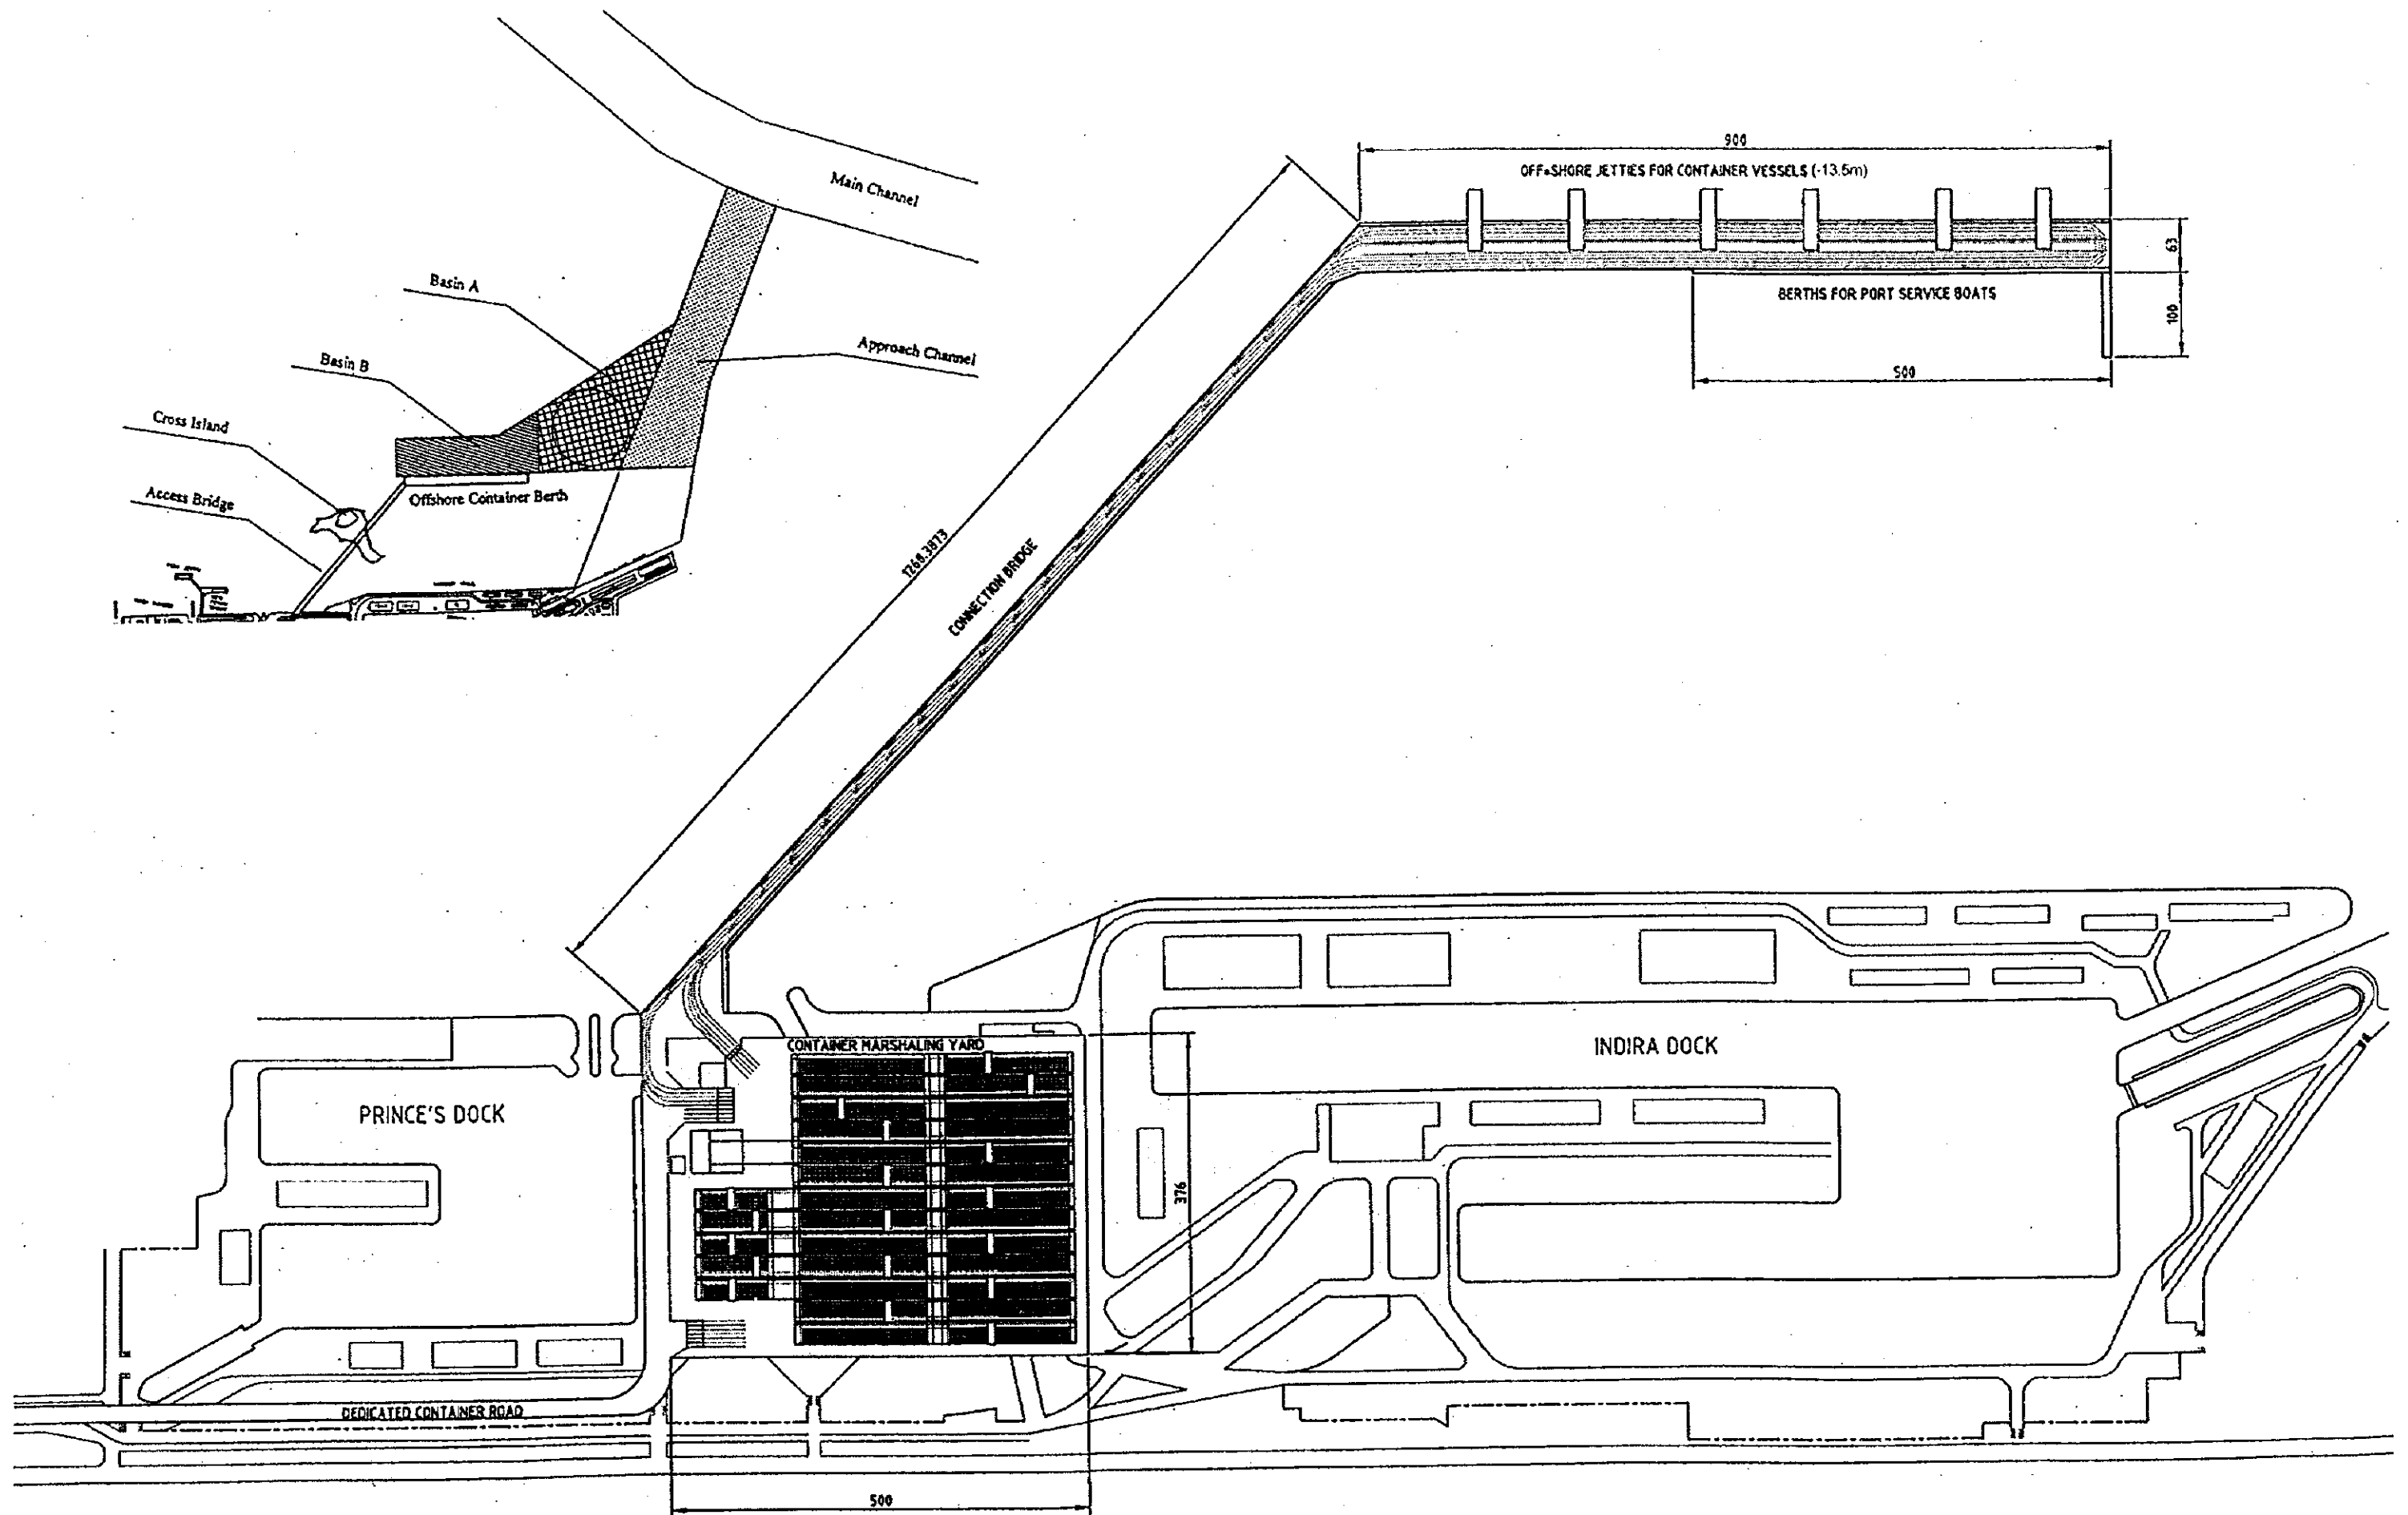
Layout Plan of A New Container Terminal at Victoria Dock (Alternative-6)
